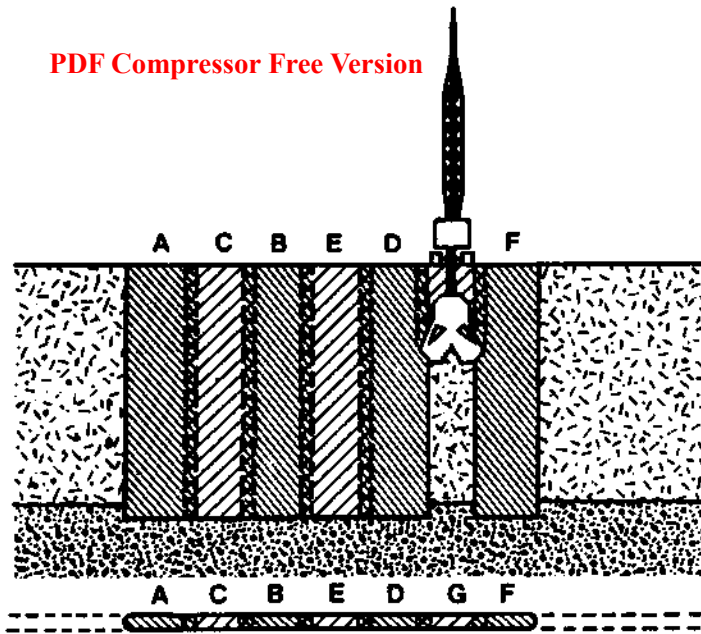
Grout diaphragm wall, 1) Order of construction of panels A, B, C, D, E, F, G; 2) ABDF primary panels, CEG secondary panels (ICOLD 1985).
